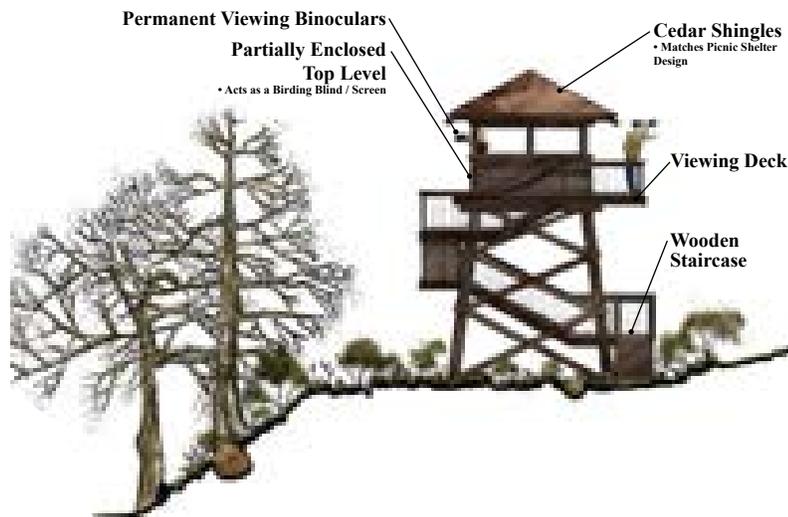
DETAIL OF THE LOOKOUT TOWER - PLACEMENT OF THE TOWER IS TO BE LOCATED IN THE NORTHWEST CORNER OF THE FORMER COLD SPRING GRANITE PROPERTY.
